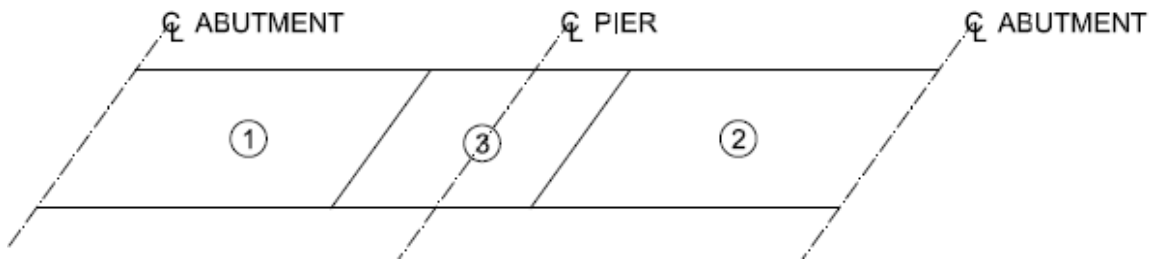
Typical sequence of casting concrete in decks for continuous-span bridges.
